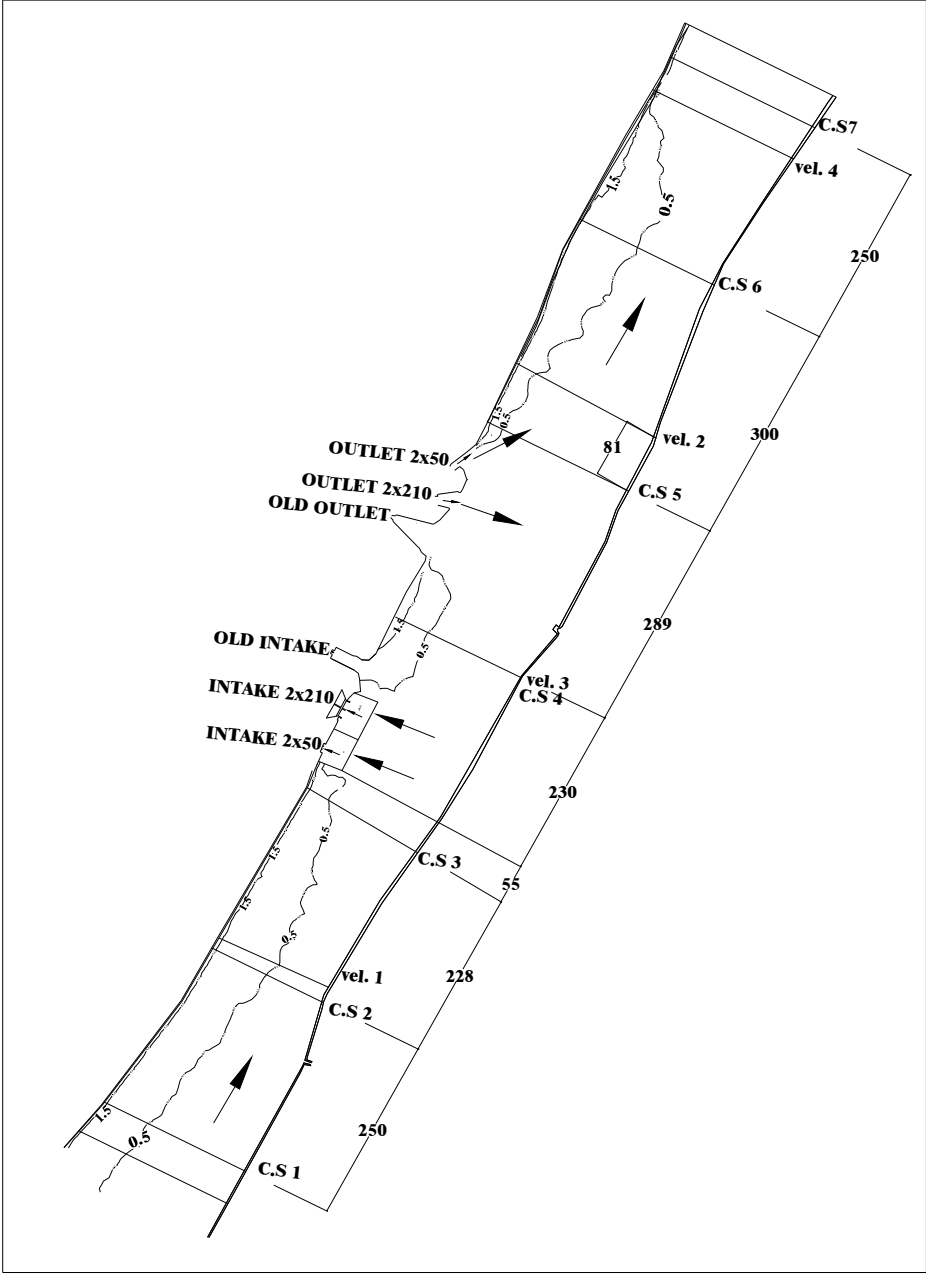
General layout of Talkha Power Plant on Damietta Nile branch.
